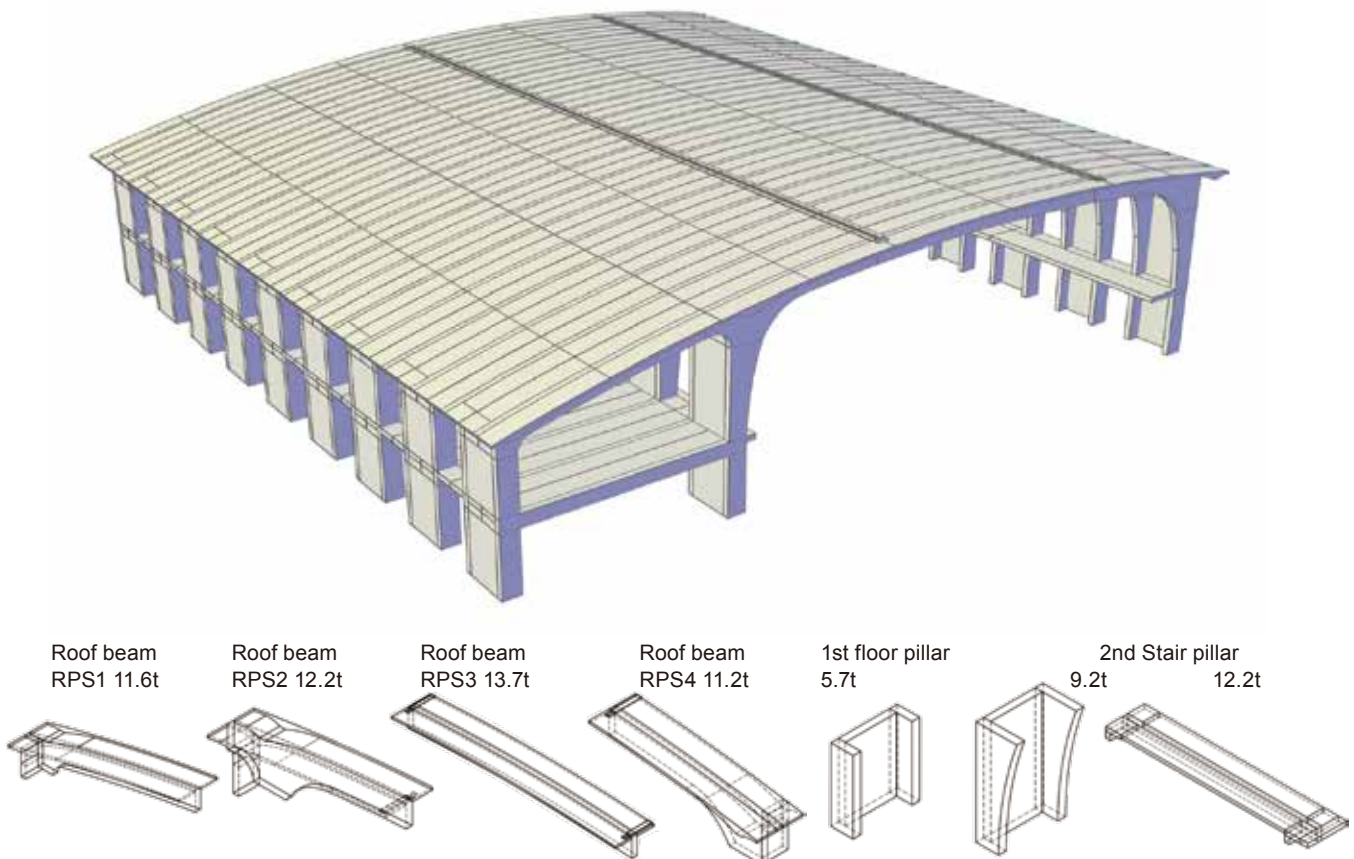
Precast-Prestressed concrete structure assembly completion perspective and 3D diagram of precast members
